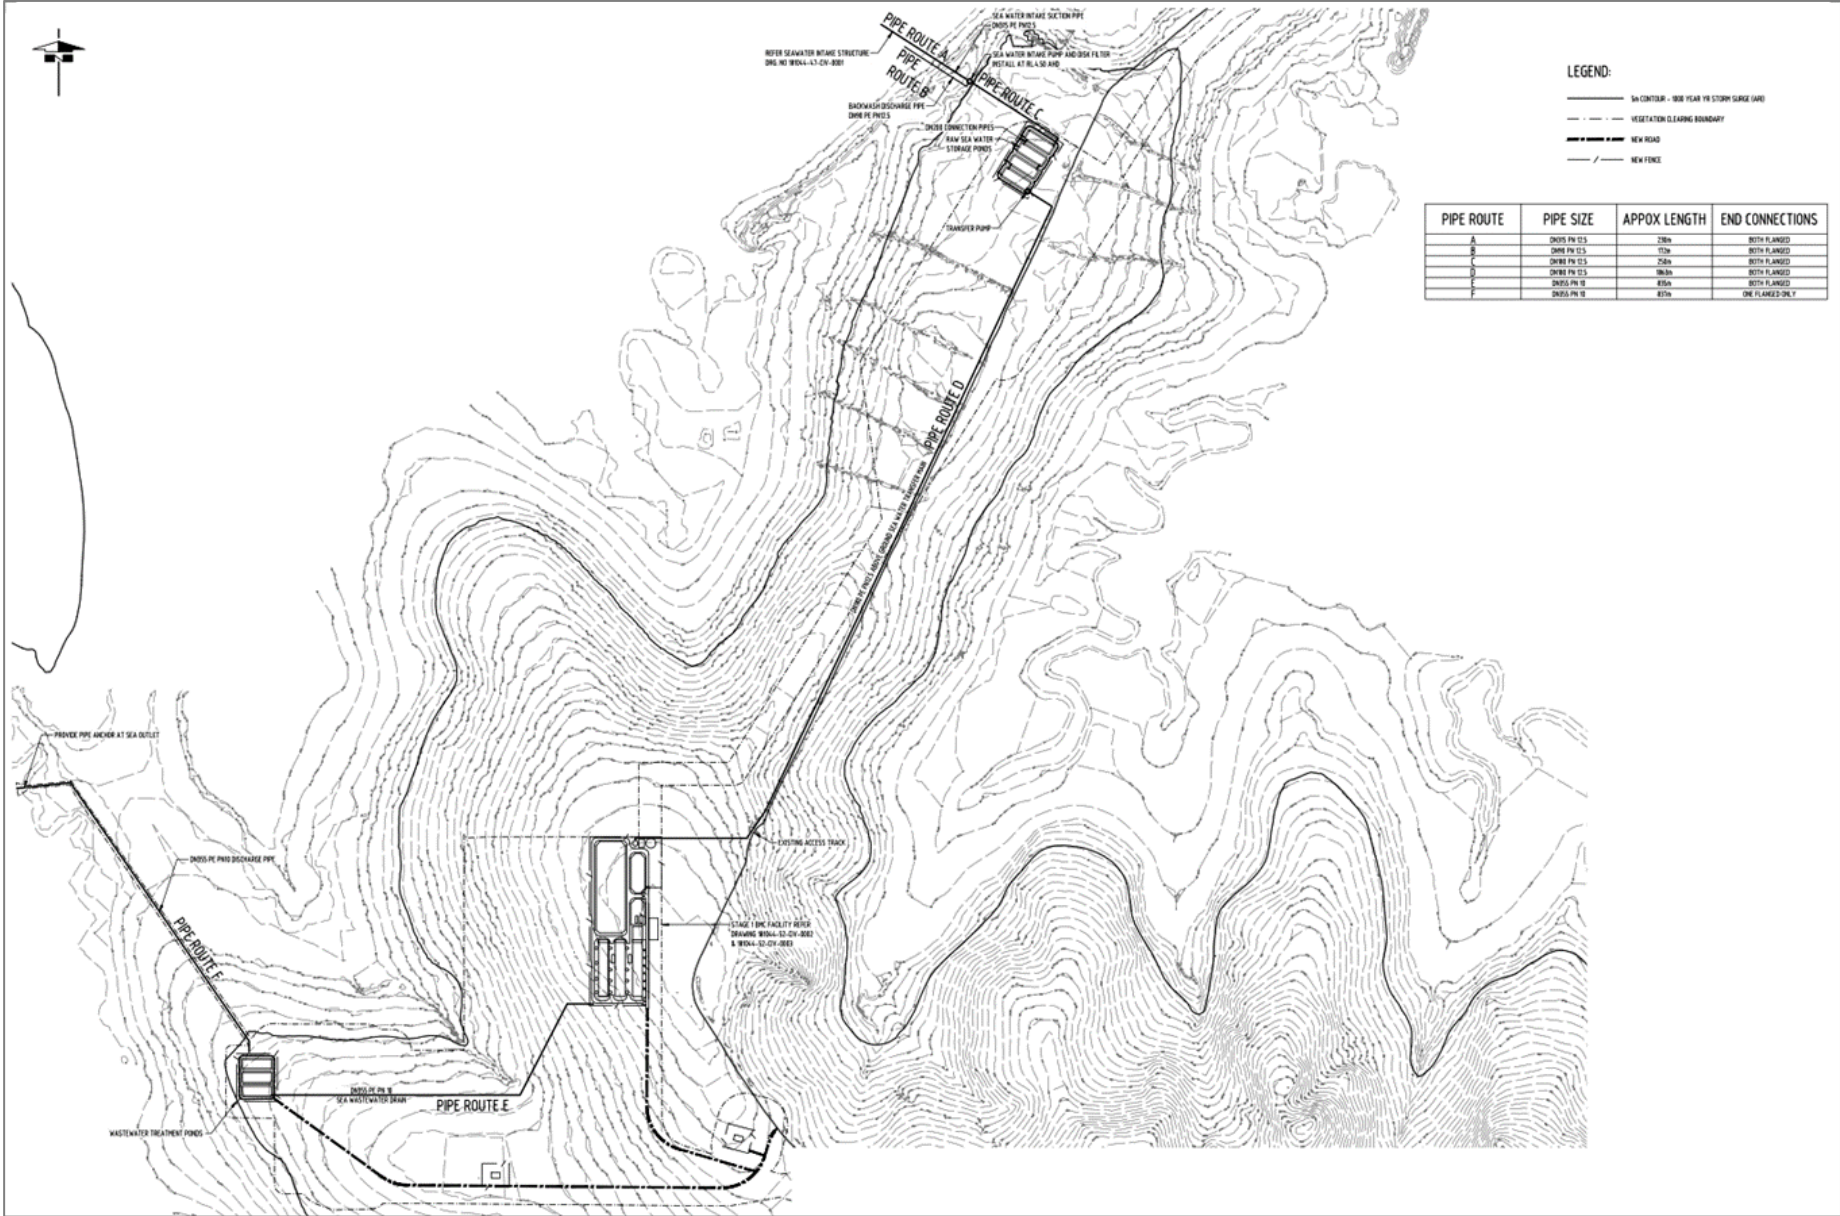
OVERALL LAYOUT PLAN HYDRAULICS
